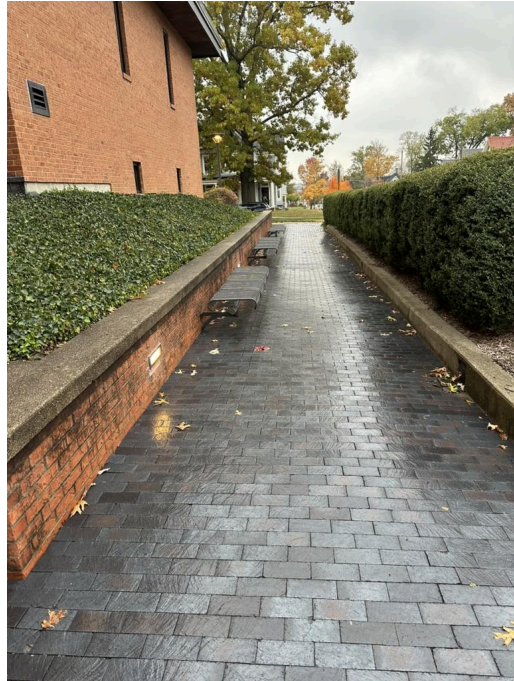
Image shows wet and slick brick pavers at the entrance on S. College Avenue.
